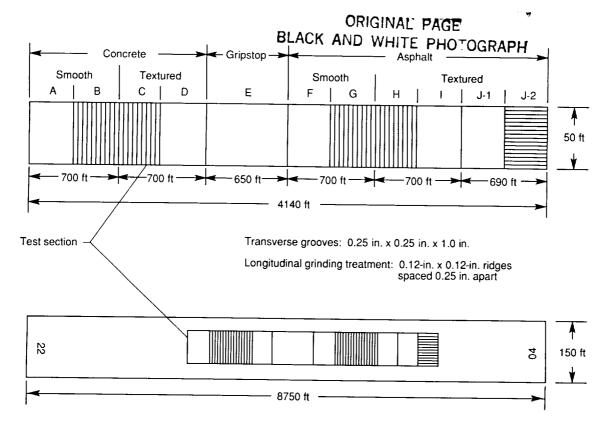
Schematic of runway 4/22 test surfaces at Wallops Flight Facility.
